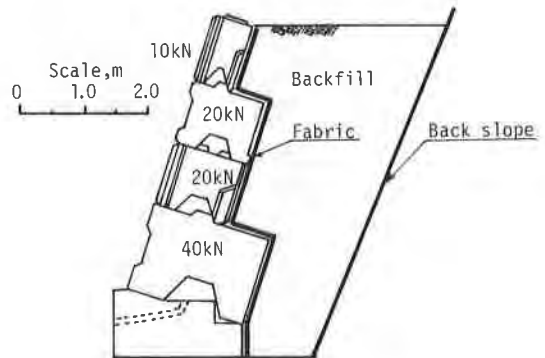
Large concrete block retaining wall with fabric sheet backside.
